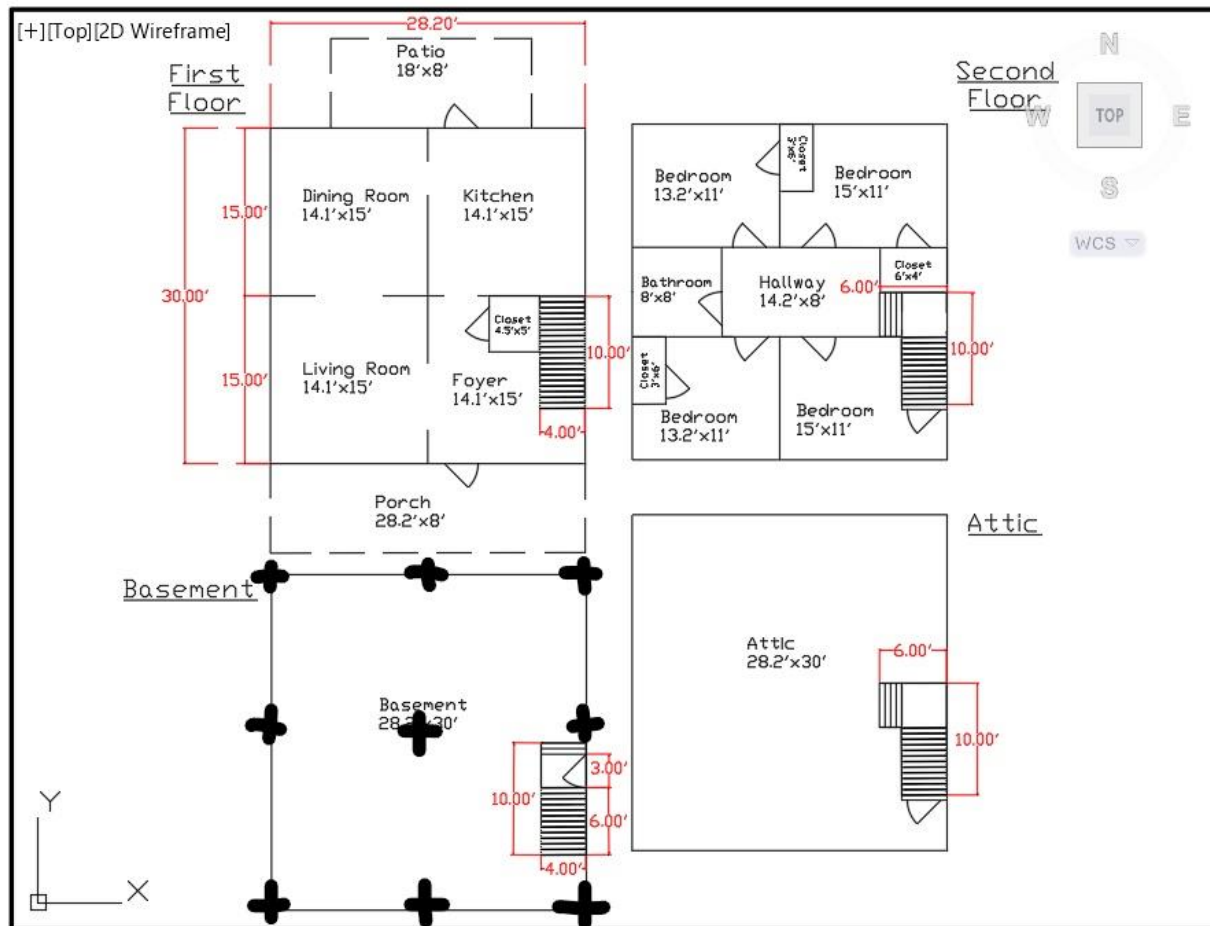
Floor plan of designed on AutoCAD, plus marks are where concrete columns are located to support the house.
